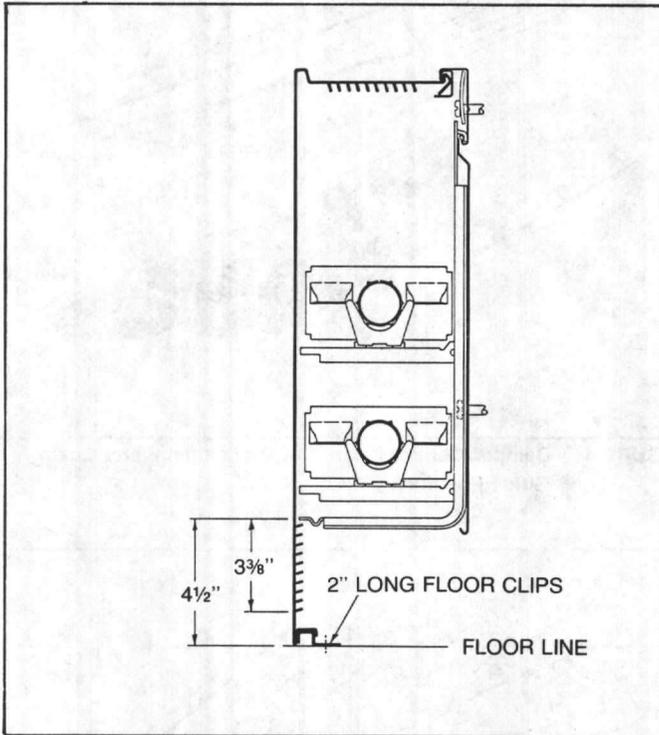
Front Inlet Enclosure with Floor Clips
